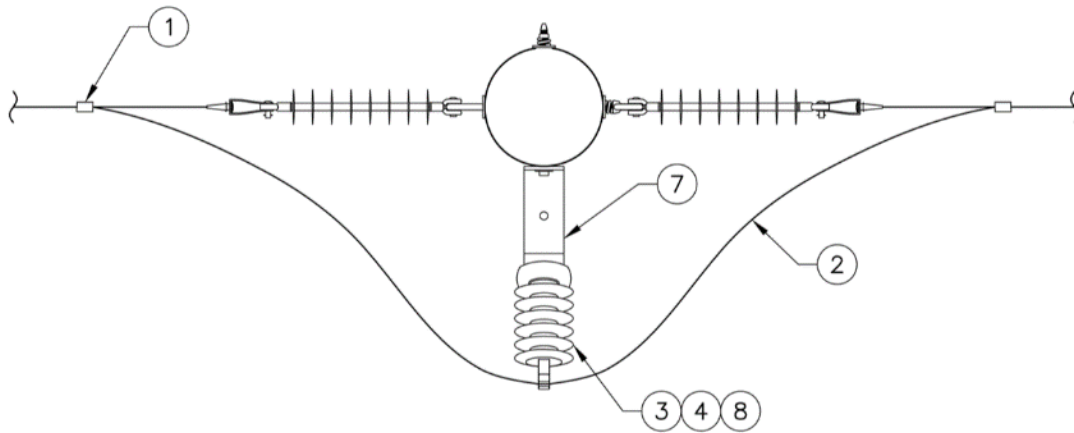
Single-Phase Single-Gain Double Deadend 0°–100° Head Pin Jumper, Top View
